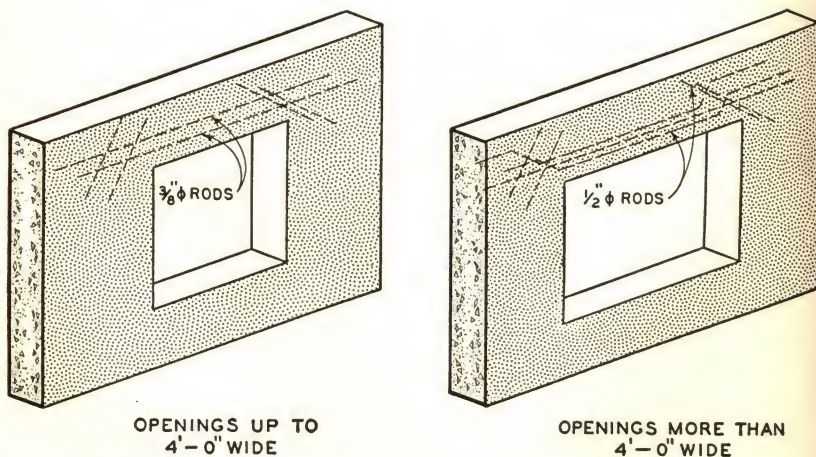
Usual Method of Reinforcing Concrete Walls over Openings
